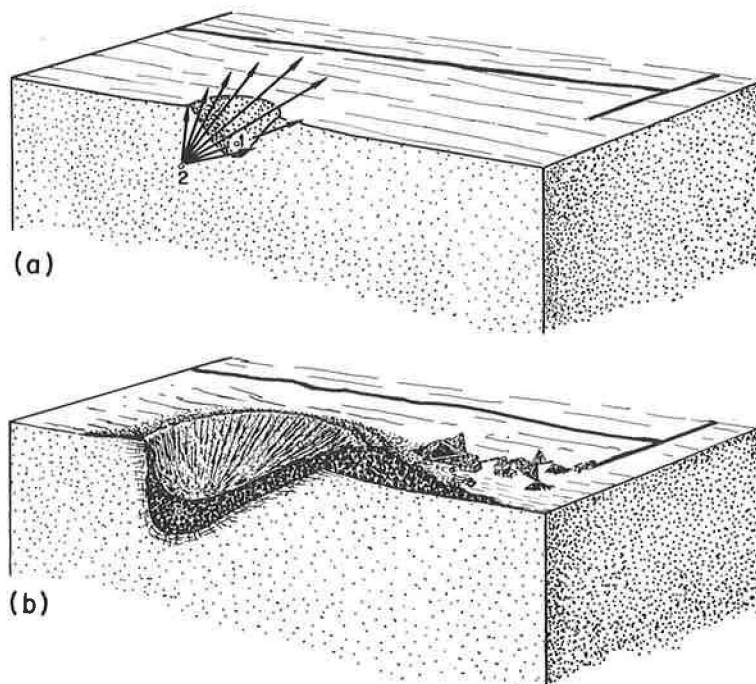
Aggregate quarry by directed nuclear explosion: (a) explosion placement and throwout zone; and (b) completed quarry showing location of ejected rubble.
